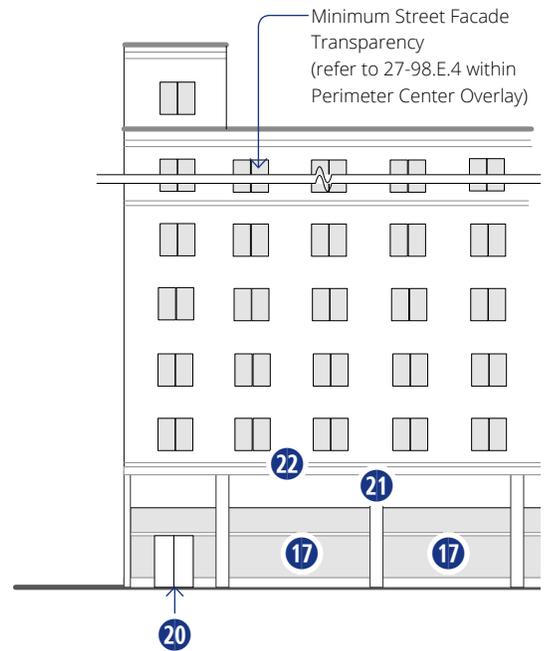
Shopfront Building: Street Facade Design Requirements
